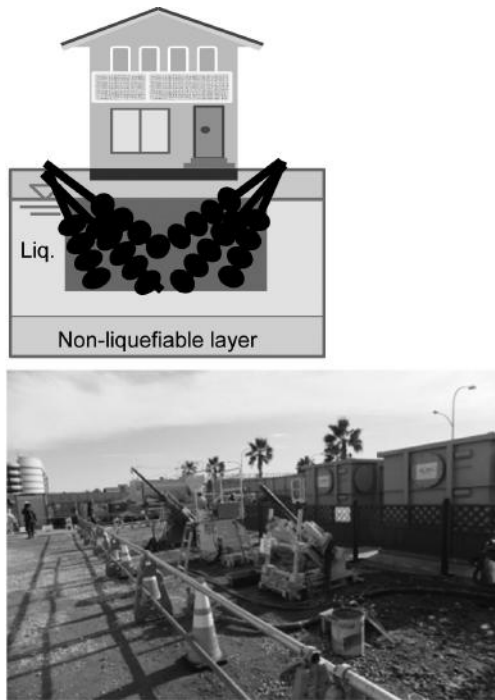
Modified compaction grouting method for existing houses, digging bore holes from outside the houses.
